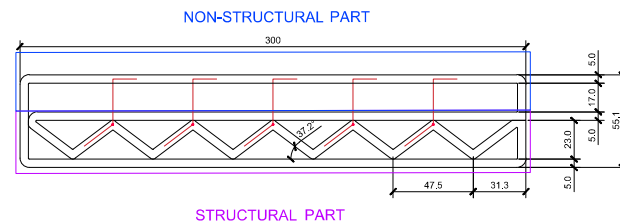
Plan view of the unreinforced 3DPC wall.
